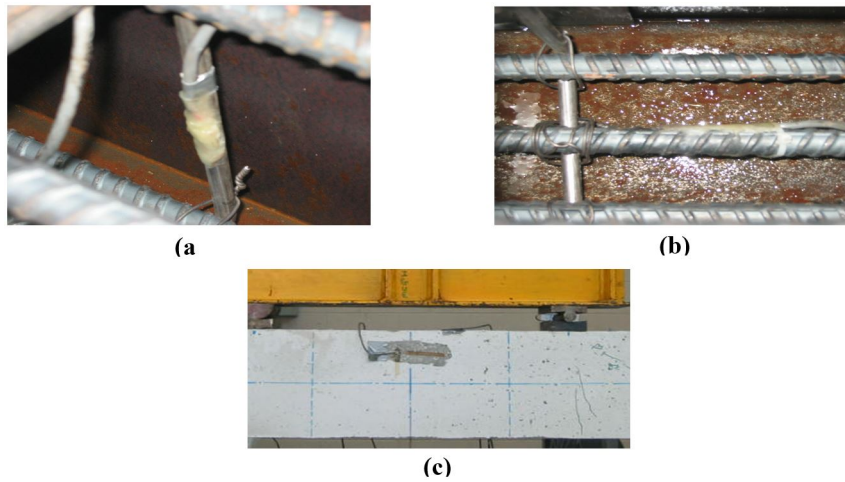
Strain gauges fitting on stirrups (a), tension reinforcement (b), and concrete surface (c)
